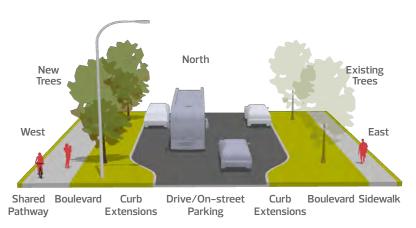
115 Street - 167 Avenue to 162 Avenue - Cross section
